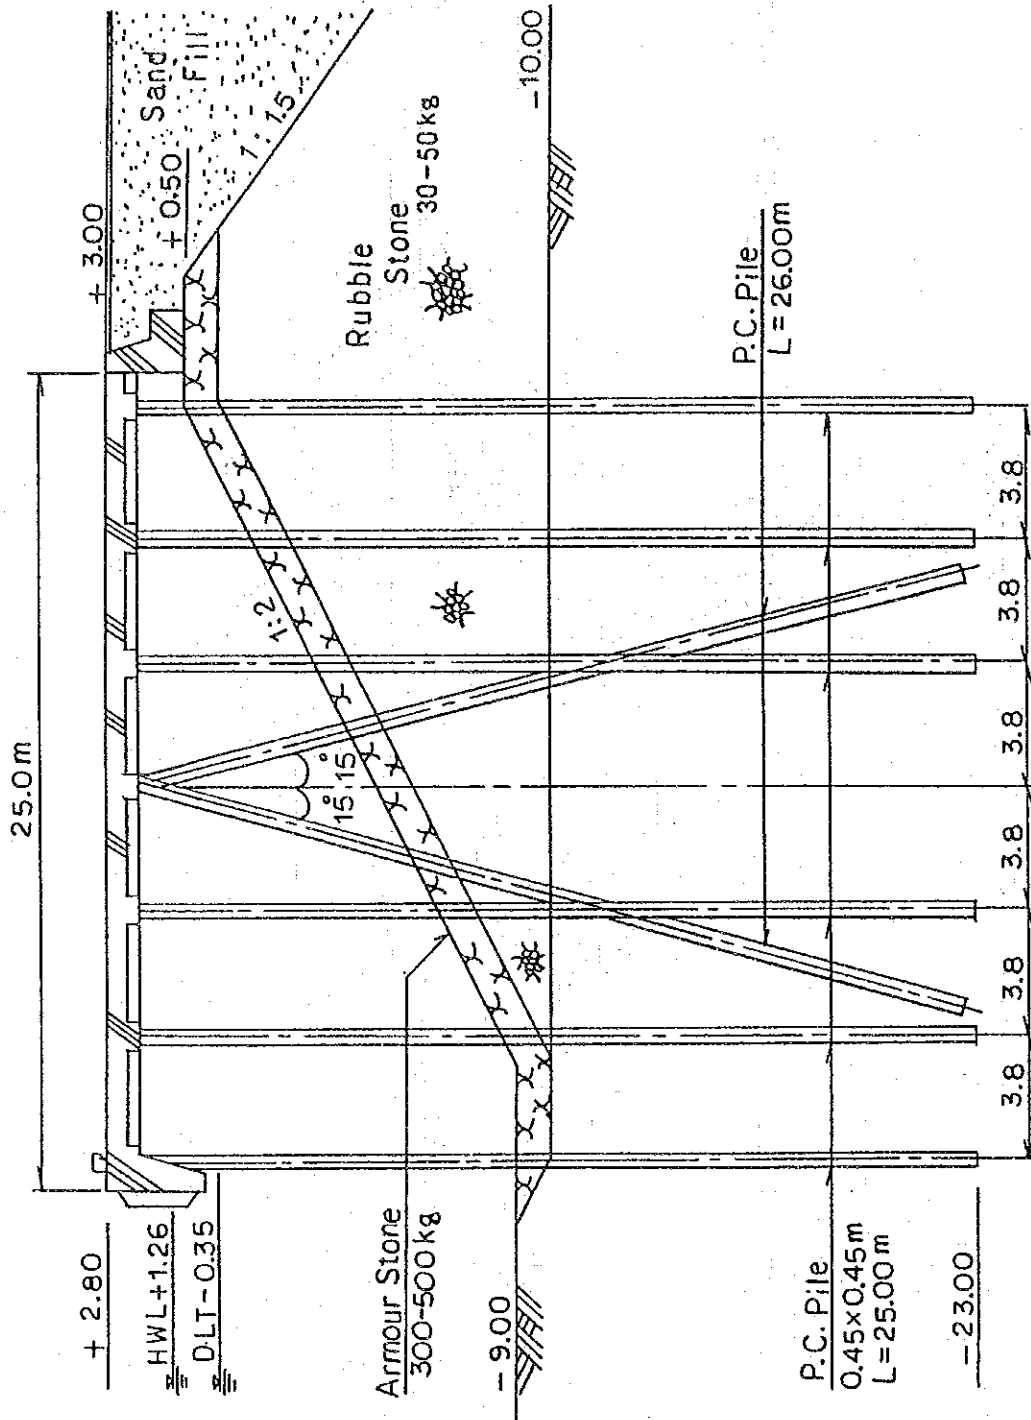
Typical Cross Section of -9m RO-RO Berth
